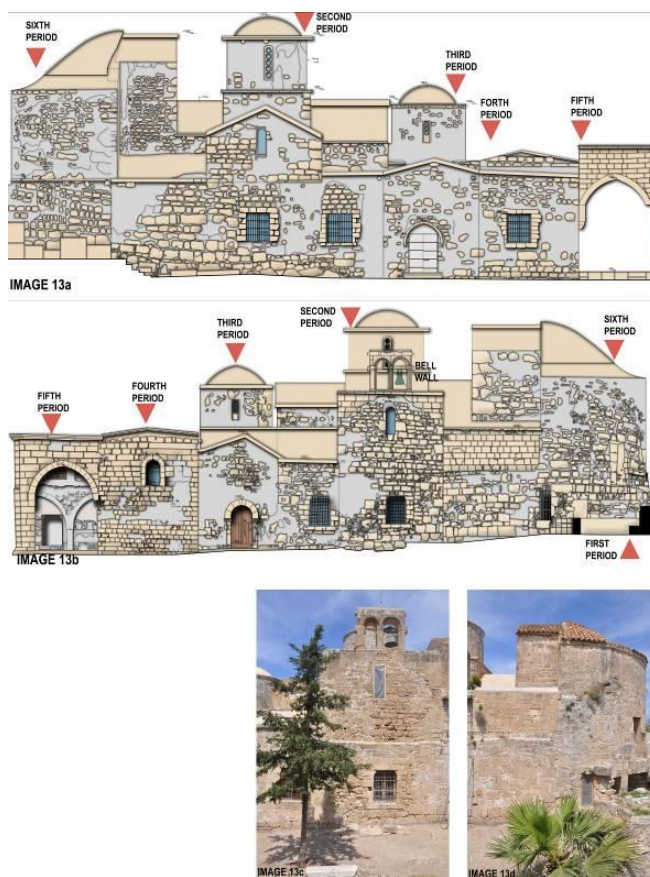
(a) Survey drawing of the church building, north elevation (b) survey drawing of the church building, south elevation (c) image of the bell tower (d) image of the raised wall
